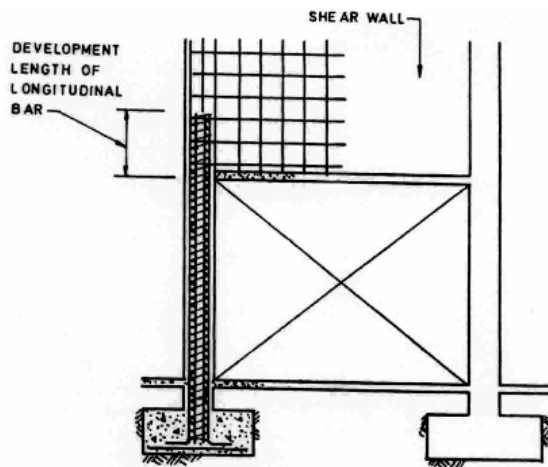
Special confining reinforcement requirements for columns under discontinued walls
